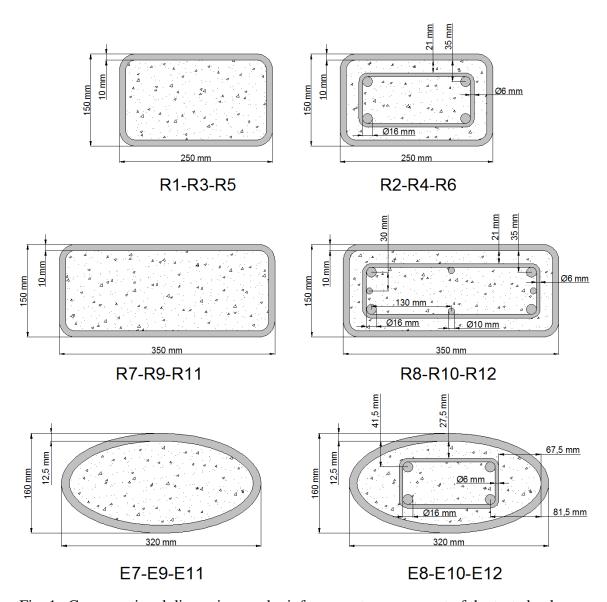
Cross-sectional dimensions and reinforcement arrangement of the tested columns
